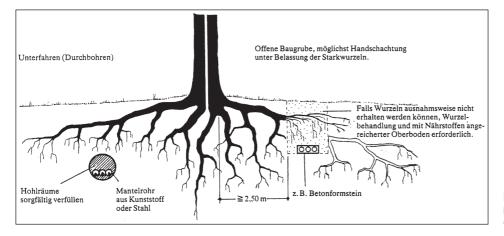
Examples of protecting underground pipes and cables in tree root zones
